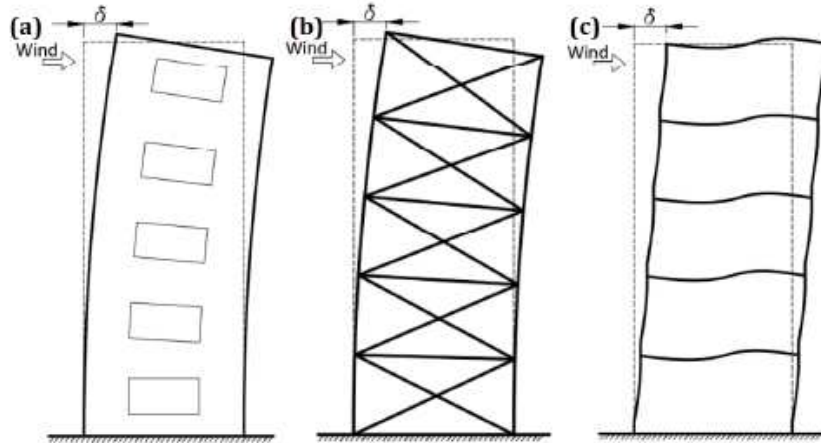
Bracing systems for multi-storey timber buildings subjected to wind load: a) CLT panels as shear walls, b) post-and-beam system with diagonal stiffeners and c) moment resisting frame system [2].
